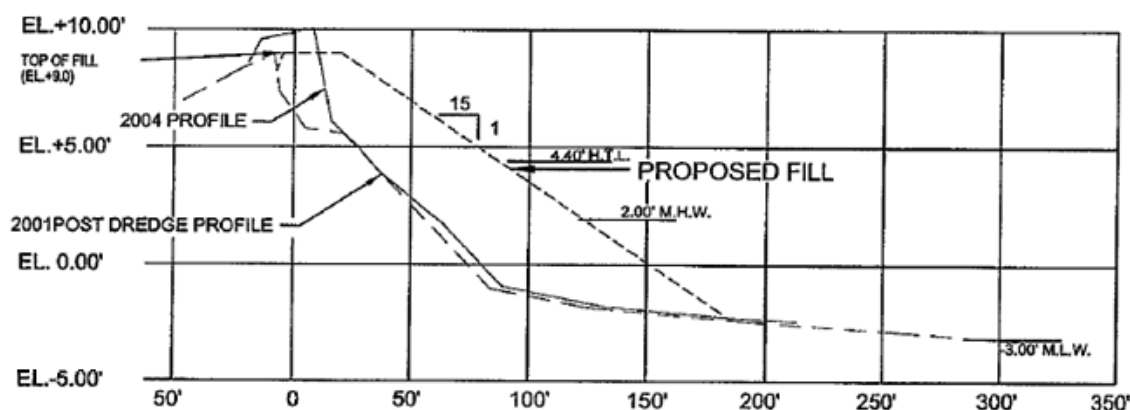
Typical fill template for past projects at Pickering Beach, vertical datum NAVD88 (from 2005 permit application).
